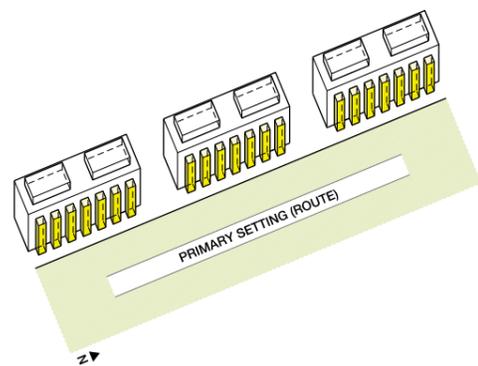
Terraced buildings bounding onto Washington Piper should continue the language of bay windows and a castellated façade.
